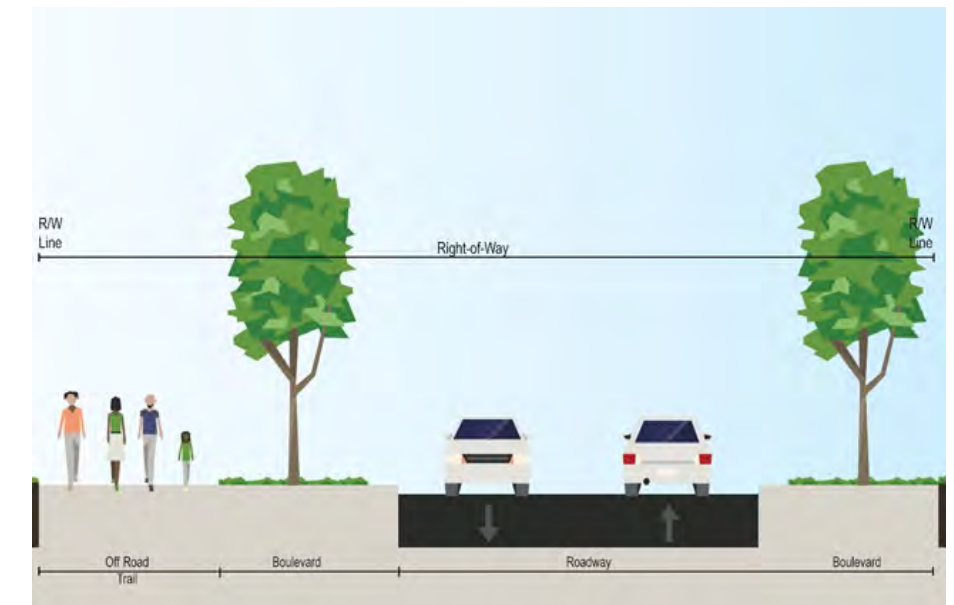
Off-Road Trail with Boulevard off Roadway
